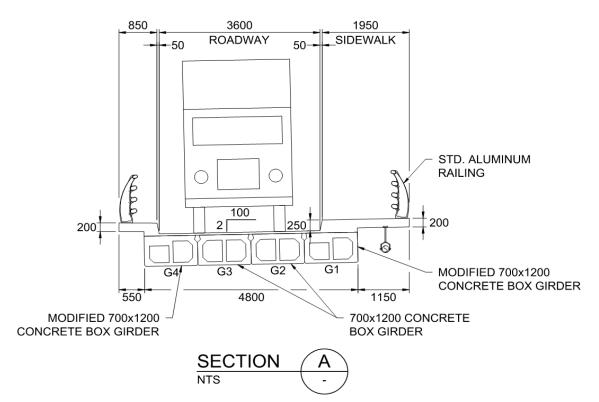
Isleview Place Bridge over Alberta Creek (Upper) - Section
